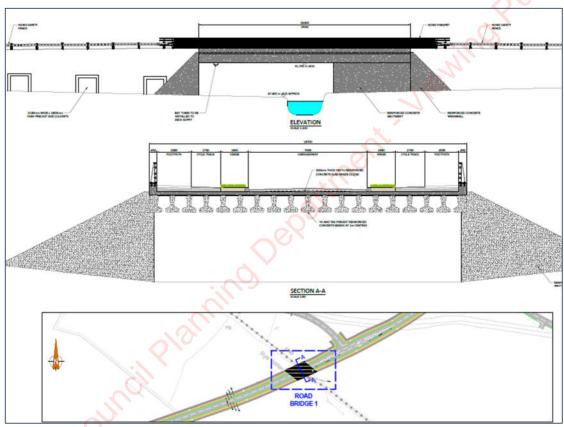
Proposed Moyglare Bridge (Road Bridge 1) – Imagery extracted from Planning Drawings (OCSC, 2022)
